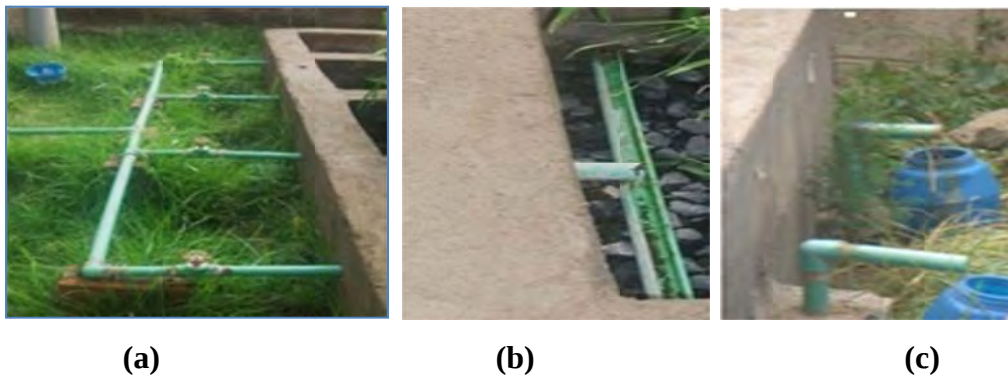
Inlet Piping (a), Wastewater Distribution Weir (b) and Adjustable Outlet Piping (c)
